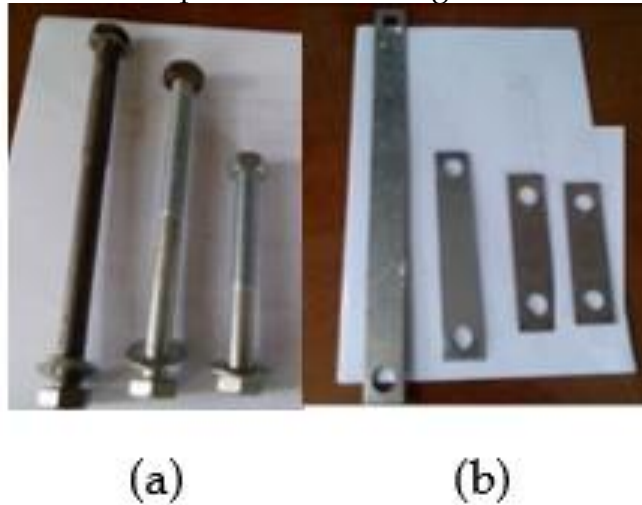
Connector Elements For RISHA Panels That Consist of: Bolts, Nuts (A), and Metal Plates (B)
